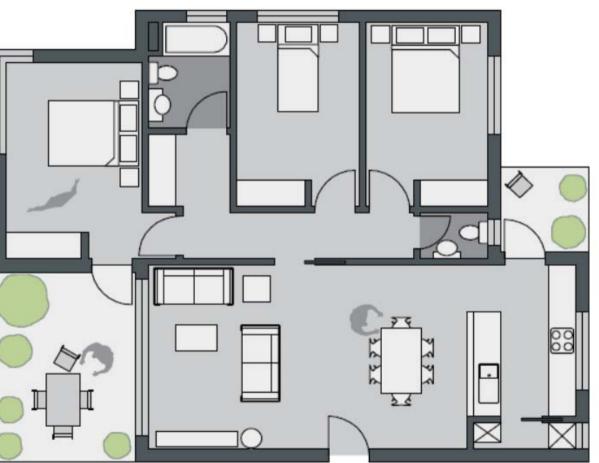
E.4 Building layout should maximise balcony use by allowing access from the main living area and a bedroom (where possible). Secondary balconies provide further amenity to apartment living and are best accessed off kitchens and laundries
